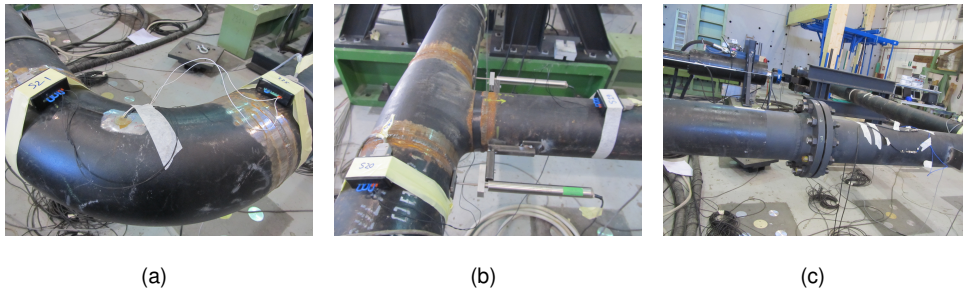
Some components of the test specimen: (a) Elbow #1; (b) Tee joint; (c) bolted flange joint.
